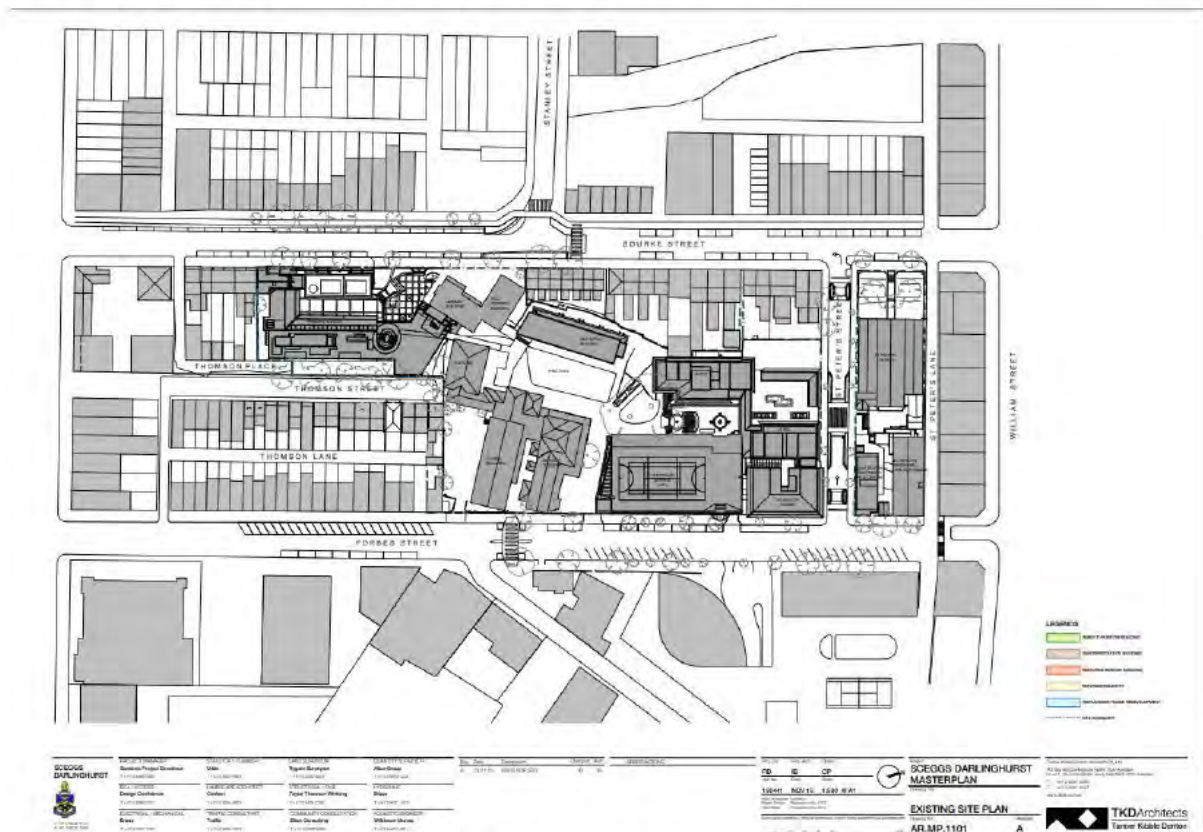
Existing Site Plan of the SCEGGS Darlinghurst Campus.
